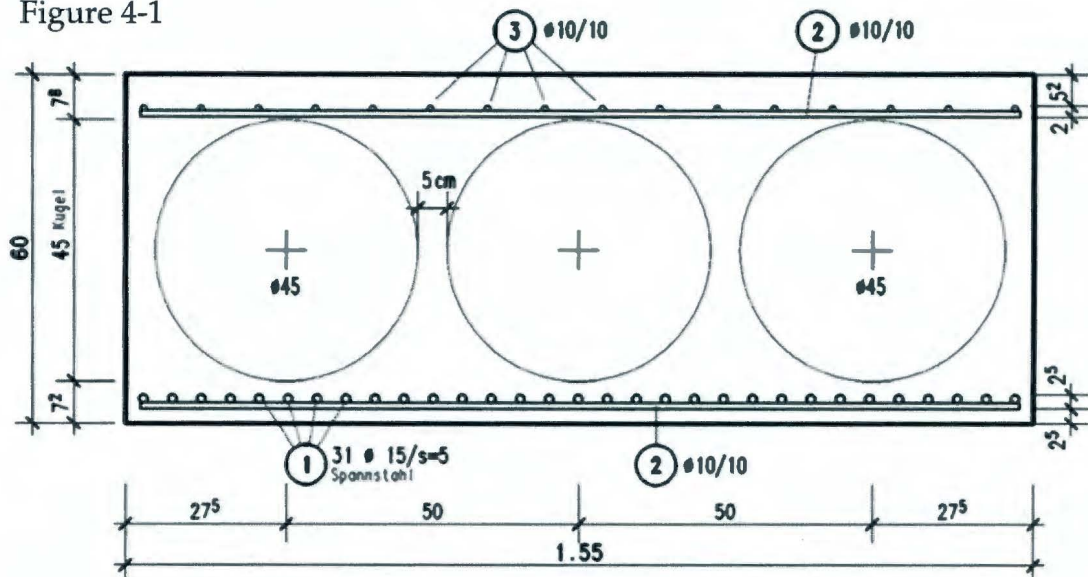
Typical Cobiax Slab Cross Section (Dimensions in cm)
